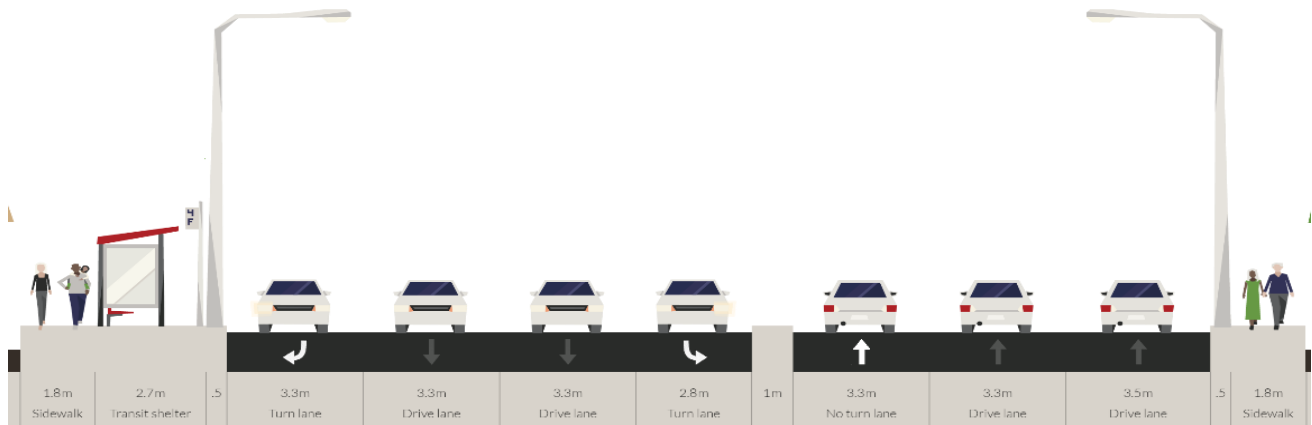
Existing Cross-section of Yonge Street at Sheppard Ave. (Looking North)
